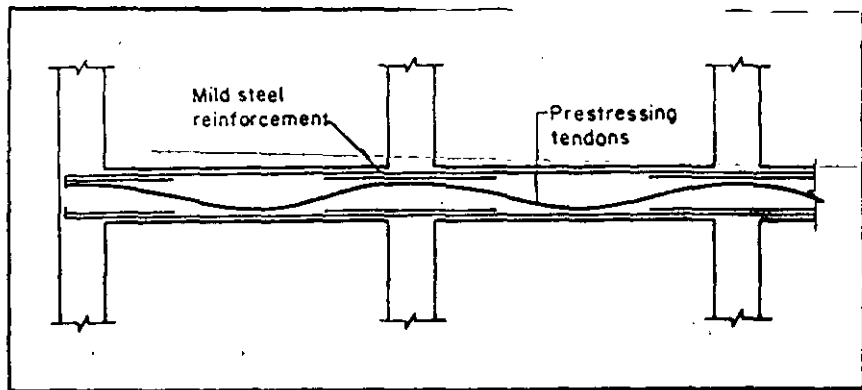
Cast-in-place frames with post-tensioned concrete beams.
